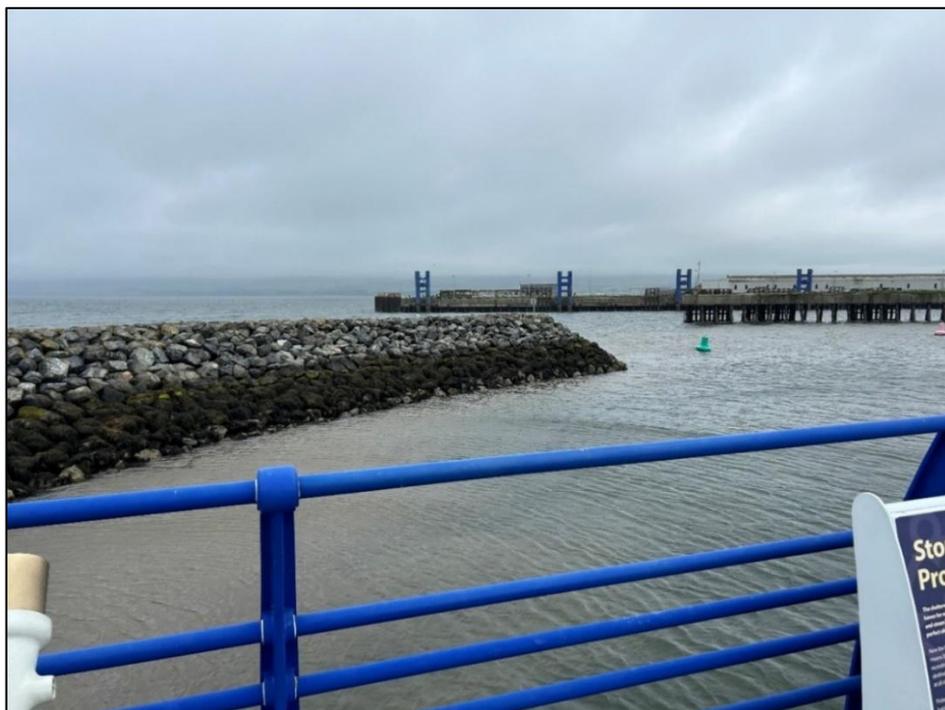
View from Coastal Walkway path towards the beach and existing slip way to the west of the existing Marina
